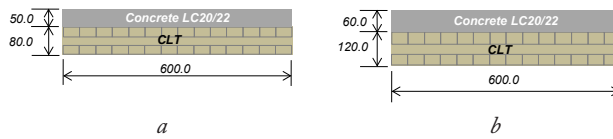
Cross-section of TC2 panels with the length of a) 4.5 m and b) 6.0 m.
